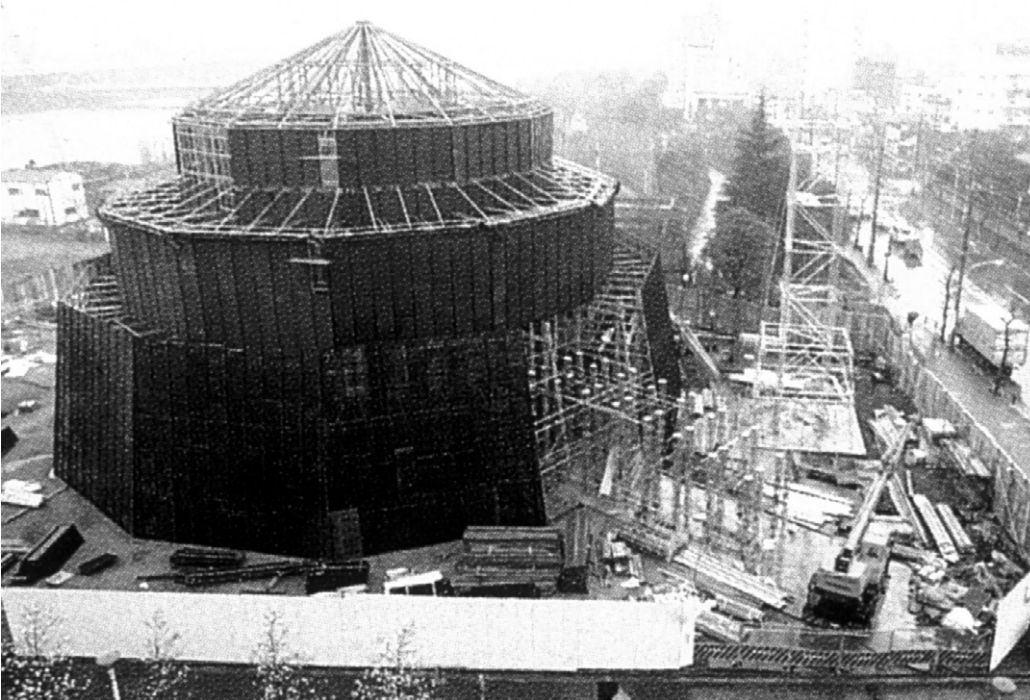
Wall and roof structure complete and cladding under-way. The entrance bridge in the foreground is under construction.
